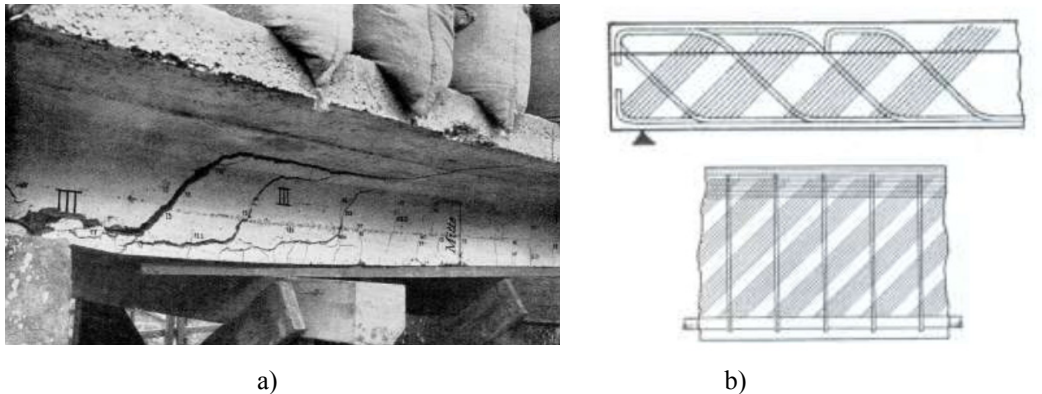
Research on shear by Morsch in 1908: a) shear failure of a T-shape beam without stirrups and b) truss model (adapted from Balázs 2010)
